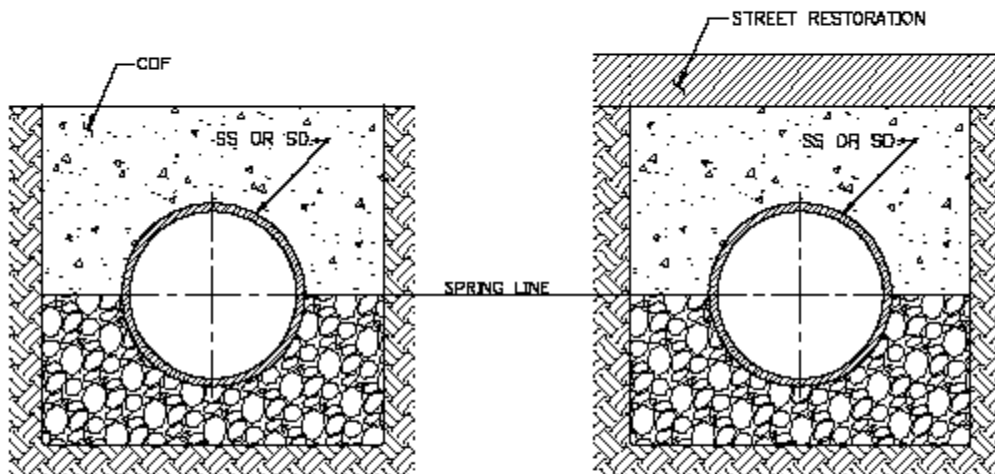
Flexible Pipe Bedding & Backfill Under Pavement Located In A Public Place
